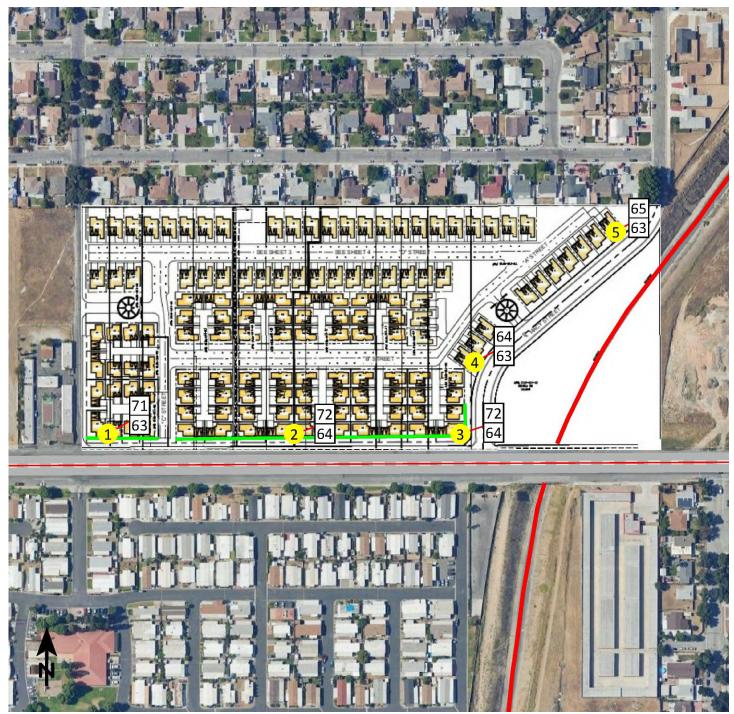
Future Transportation Noise Levels With Six Foot Concrete Wall
